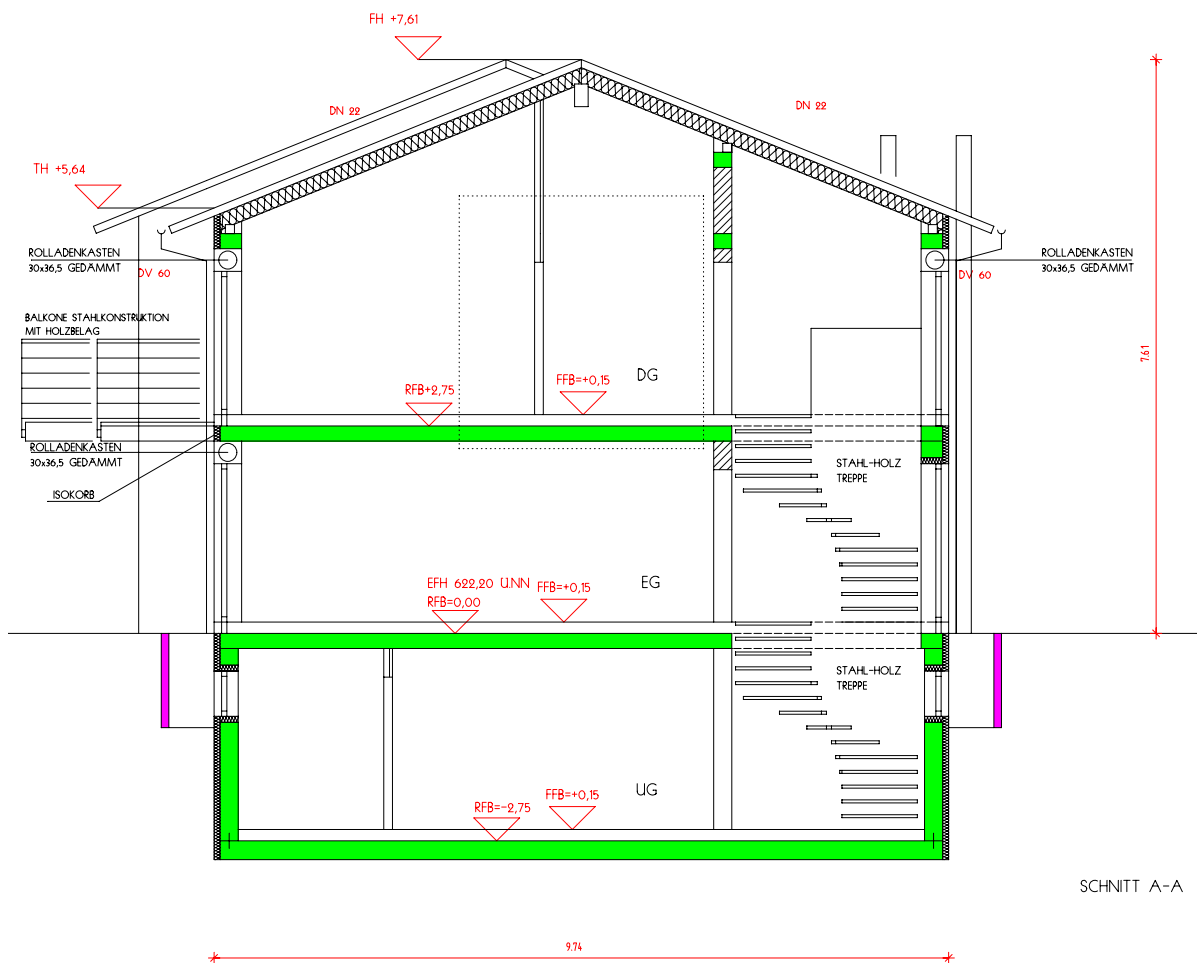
Single family house building section showing the unheated basement, ground floor, and first floor [149].
